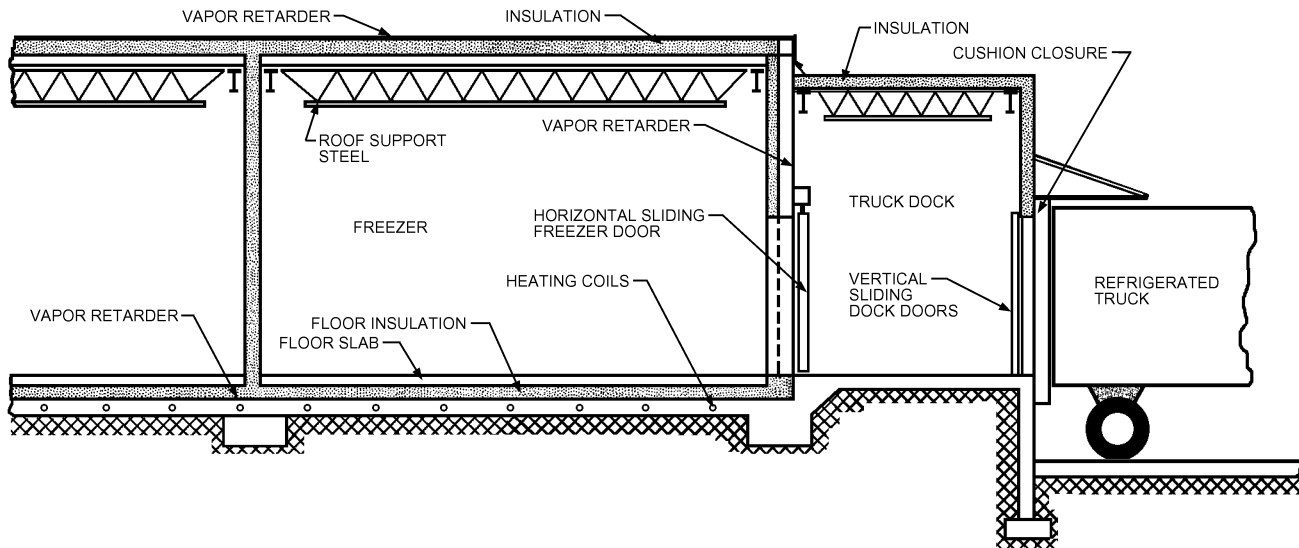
Typical One-Story Construction with Underfloor Warming Pipes
